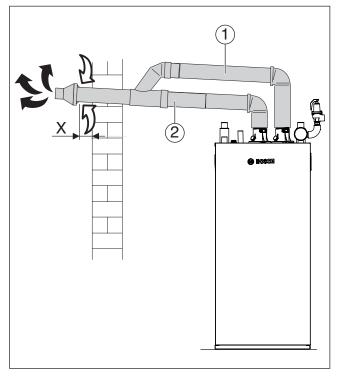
Horizontal venting system (sealed combustion); X≥4" (102 mm)
